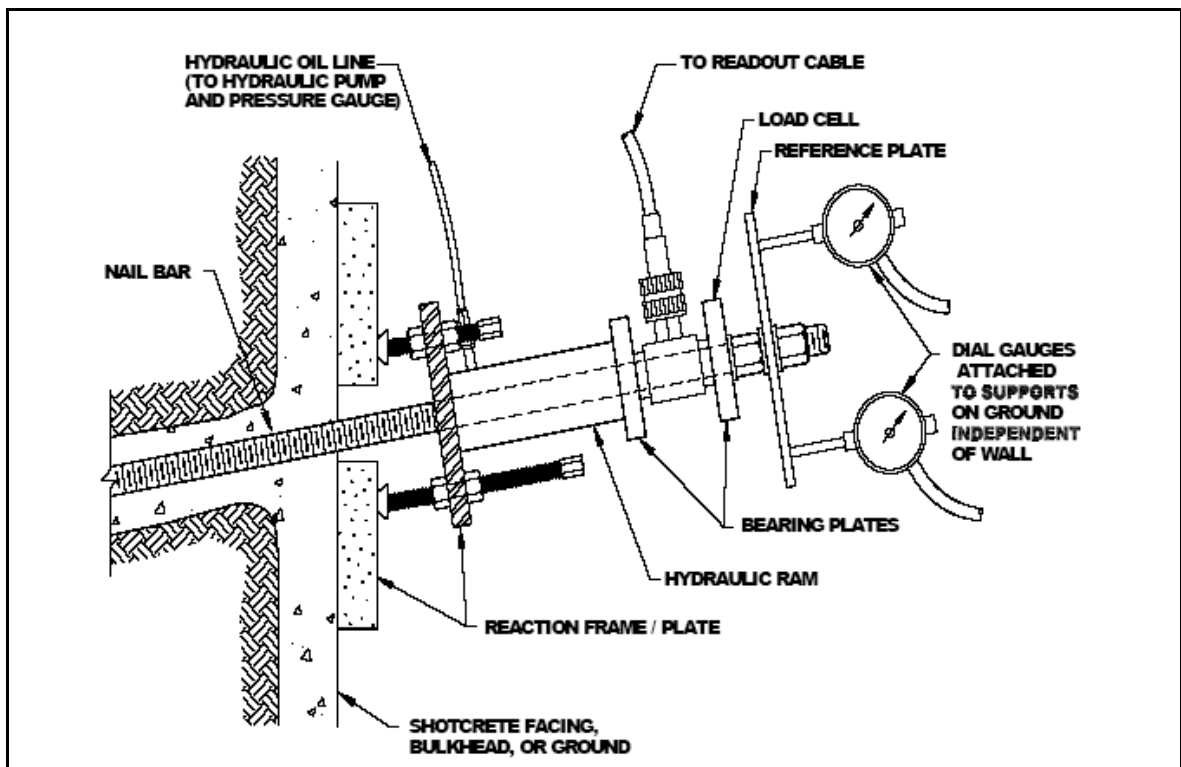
Schematic layout of a soil nailing testing system (FHWA, 1998)
